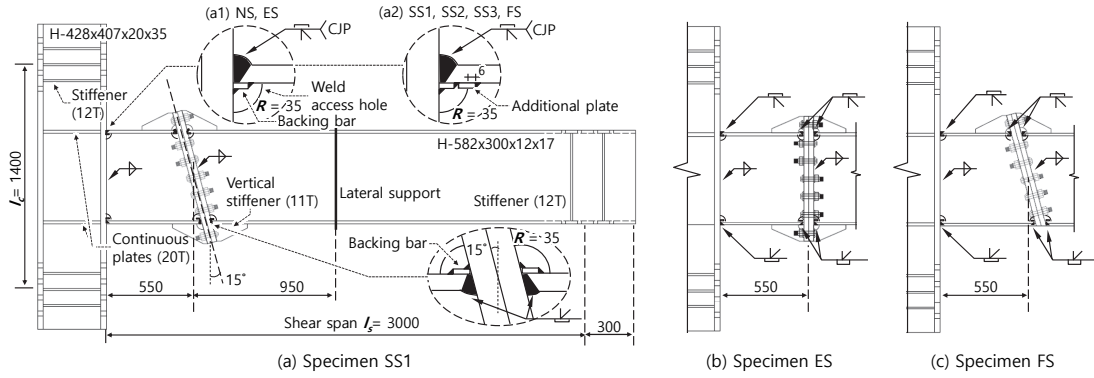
Configuration and details of inclined end-plate beam splice and beam-to-column moment connection
